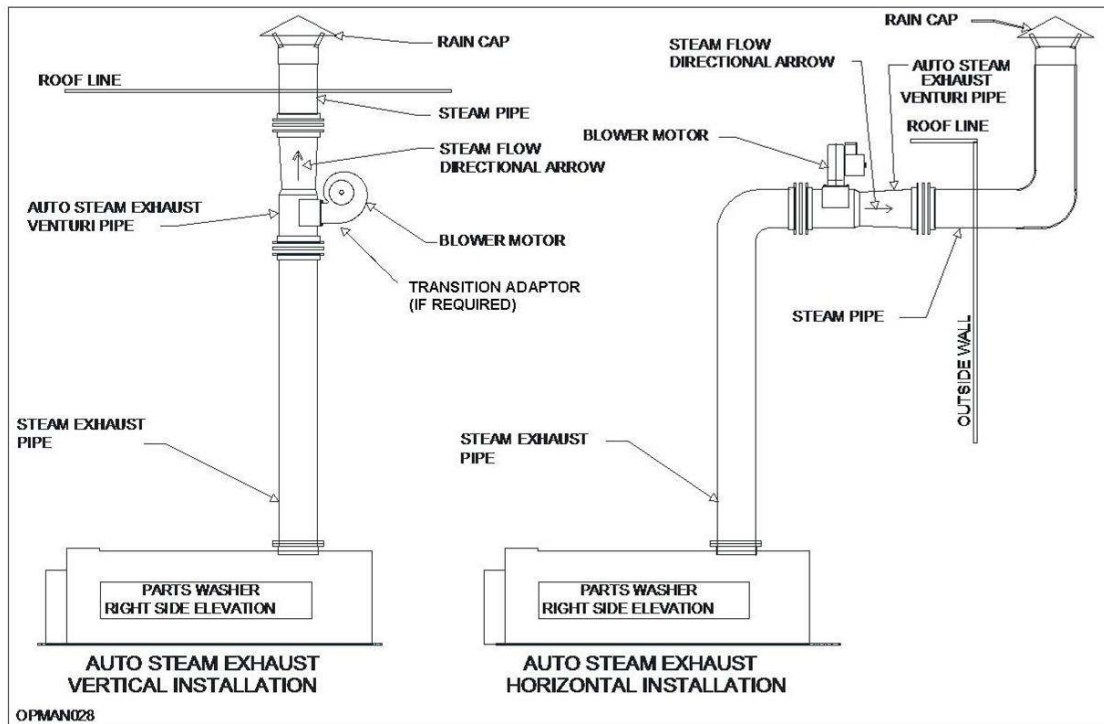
13: Auto Steam Exhaust (ASE) Piping and Blower Installation Configurations
